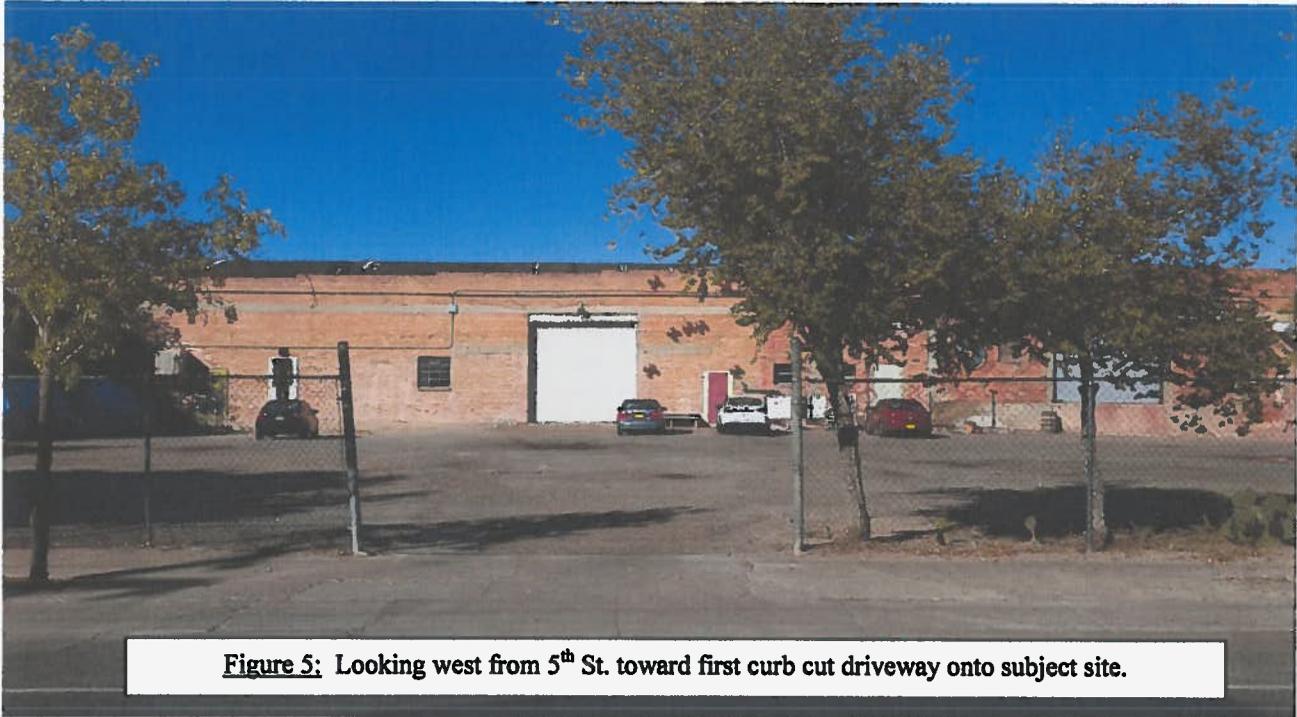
Looking west from 5th St. toward first curb cut driveway onto subject site.
